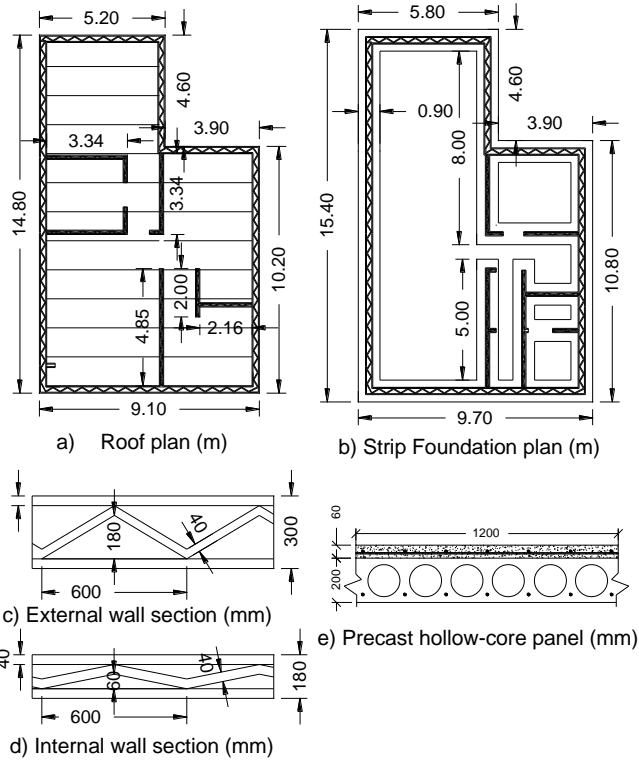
The 3DCP villa: a) Roof plan with precast panels; b) Strip foundation plan; c) Printed external wall section; d) Printed internal wall section; e) Precast hollow-core slab section.
